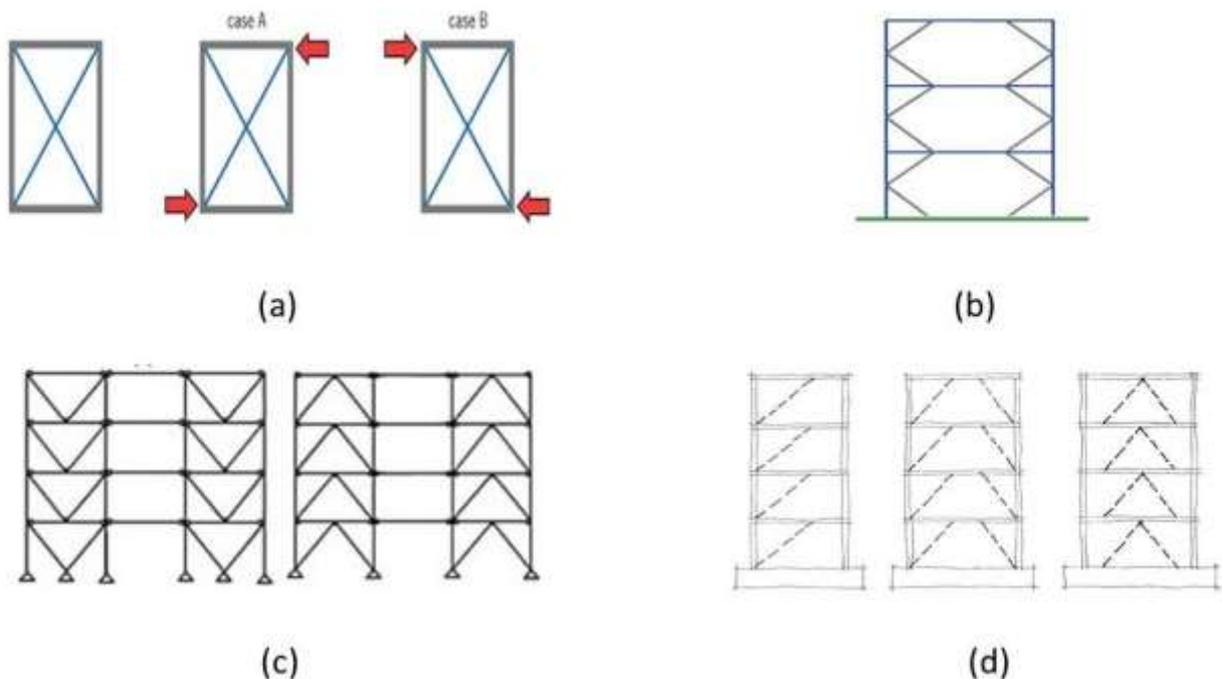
(a) Cross Bracing, (b) K-Bracing, (c) V-Bracing, (d) Eccentric Bracing [26]
